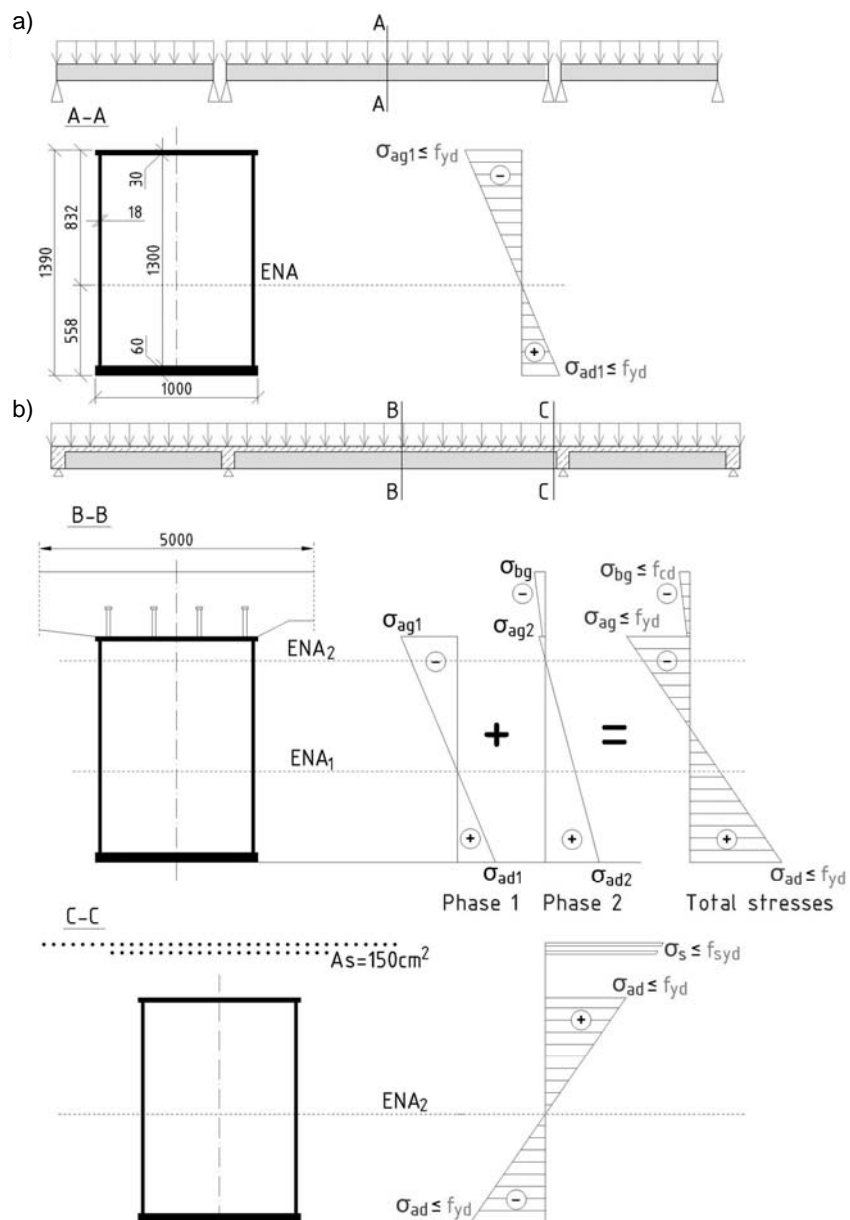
Stress distribution and idea of ULS verification for: a) steel cross-section in the phase of erection (simple supported steel girders), b) composite cross-section in sagging and hogging bending moment zone (superstructure with reinforced concrete support cross beams)
